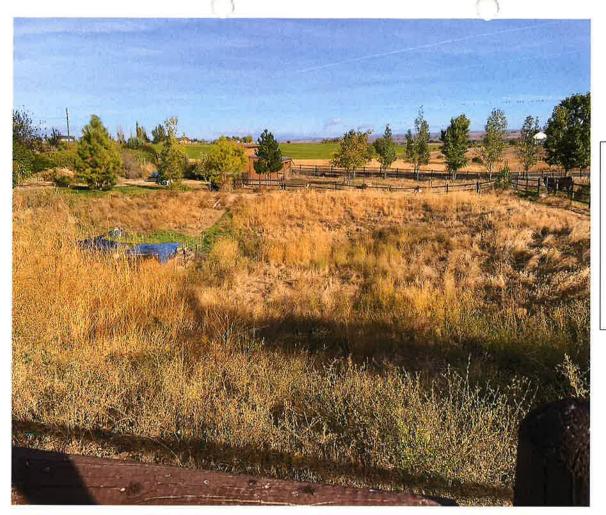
Retention pond for overflow of storage pond. This pond was dry and had a chicken coop in it, indicating there was not much overflow.
